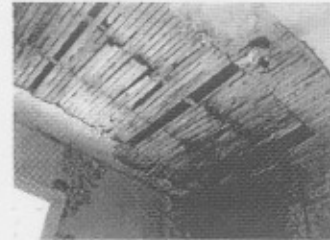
Ceiling of Hotel Third Floor (Roof)
